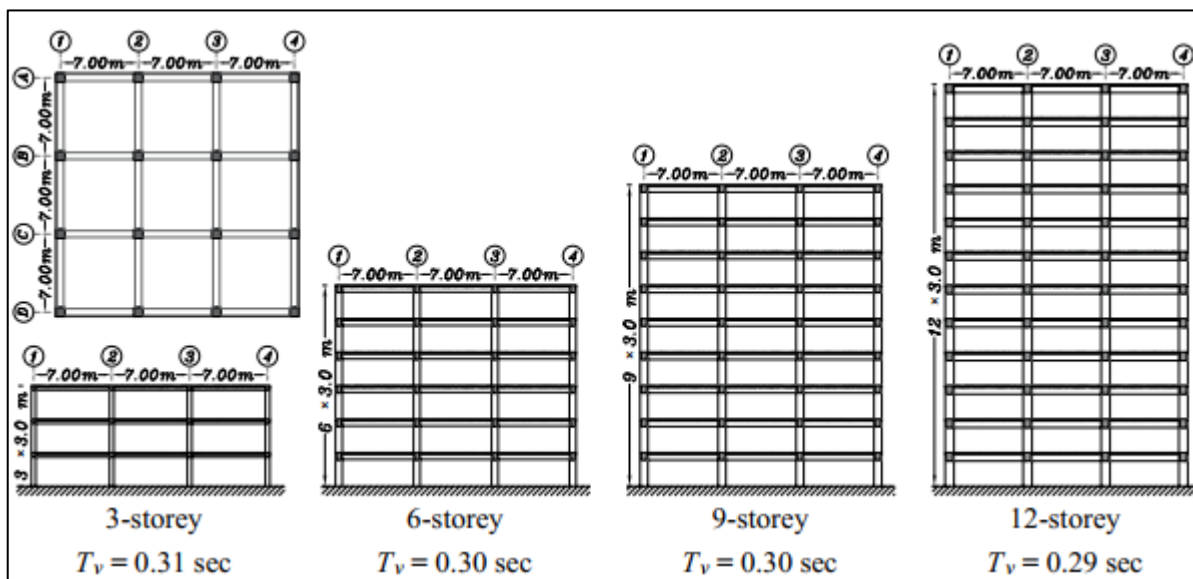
Plan and elevation views of the archetype RC moment-resisting frame buildings used in this study, along with the vertical period of the structures' first mode
